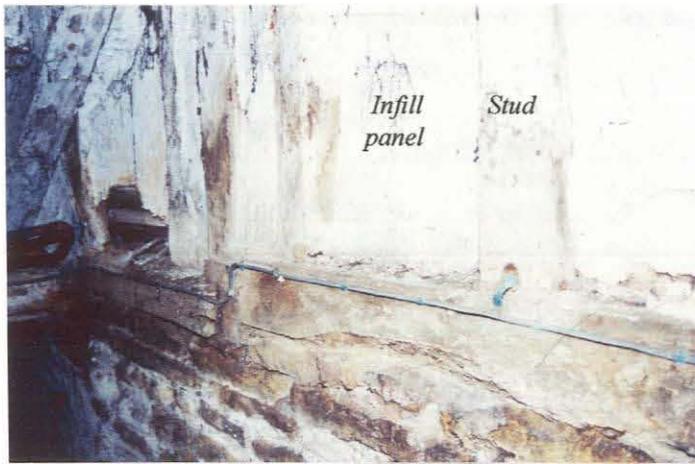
Cellar stairway 65/19, no.65; south side of stairway wall. The lower reaches comprise rubble, but the upper reaches of the wall display vertical posts (studs) set upon a wooden sill beam, with lath and plaster and reed infill panels between.
